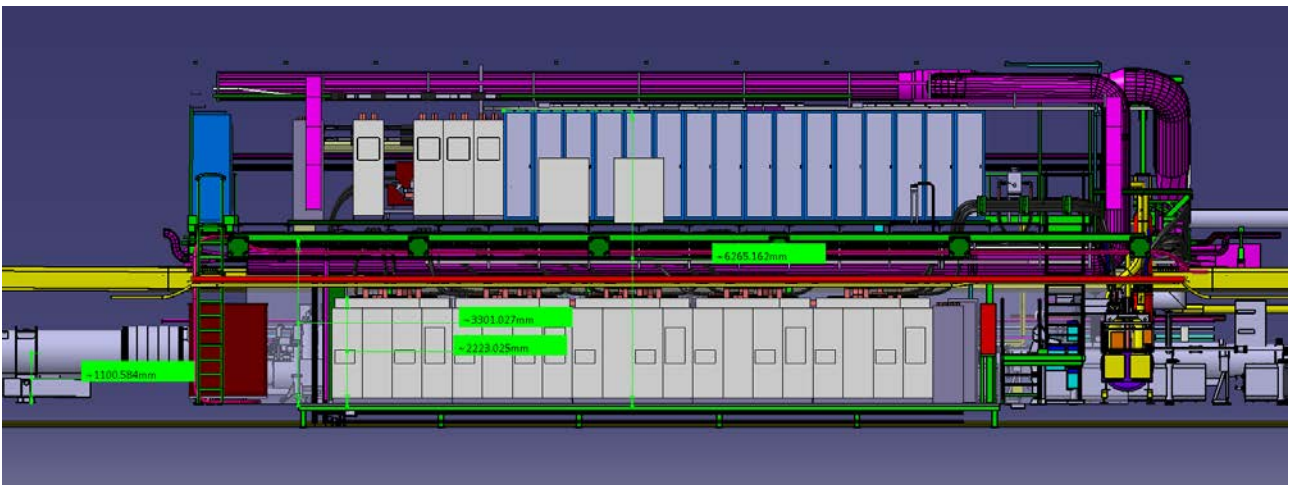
Present CAD drawing layout of the installed equipment in RR13 with equipment heights, ST number ST0509462
